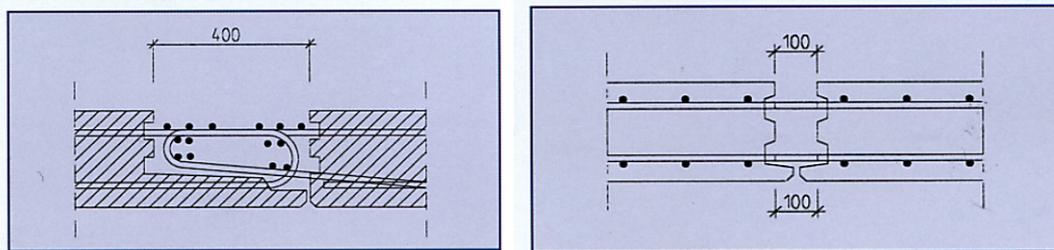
Comparison of joints between prefabricated deck slabs; the conventional joint (left) and the new joint (right).
